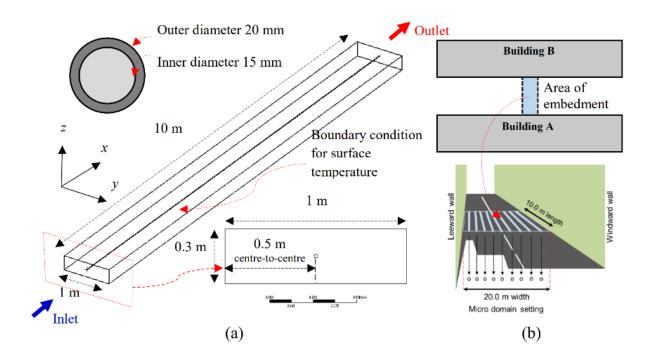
U-RPSC section model with 1 pipe (a) size of domain, pipe and pavement body (b) pipe embedment within street canyon of urban domain.
